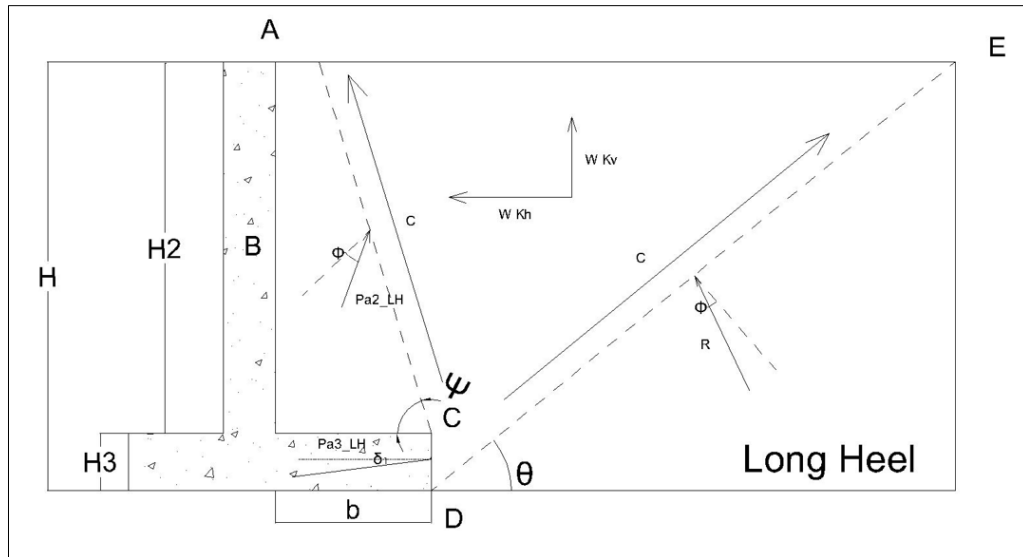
Failure surfaces behind a cantilever retaining wall with long heel
